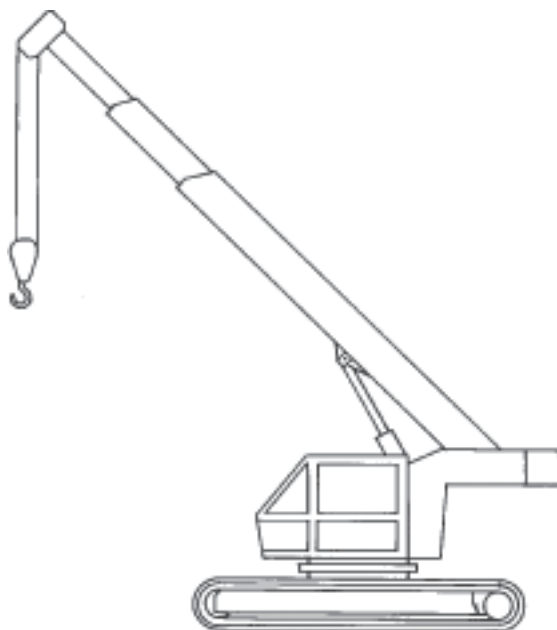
Crawler-mounted telescoping boom with slewing upper structure
